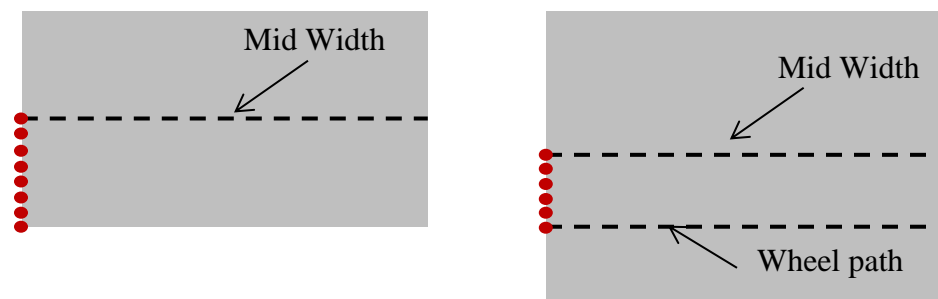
Location of stress analysis points used to compute longitudinal cracking for standard width (left) and widened slabs
